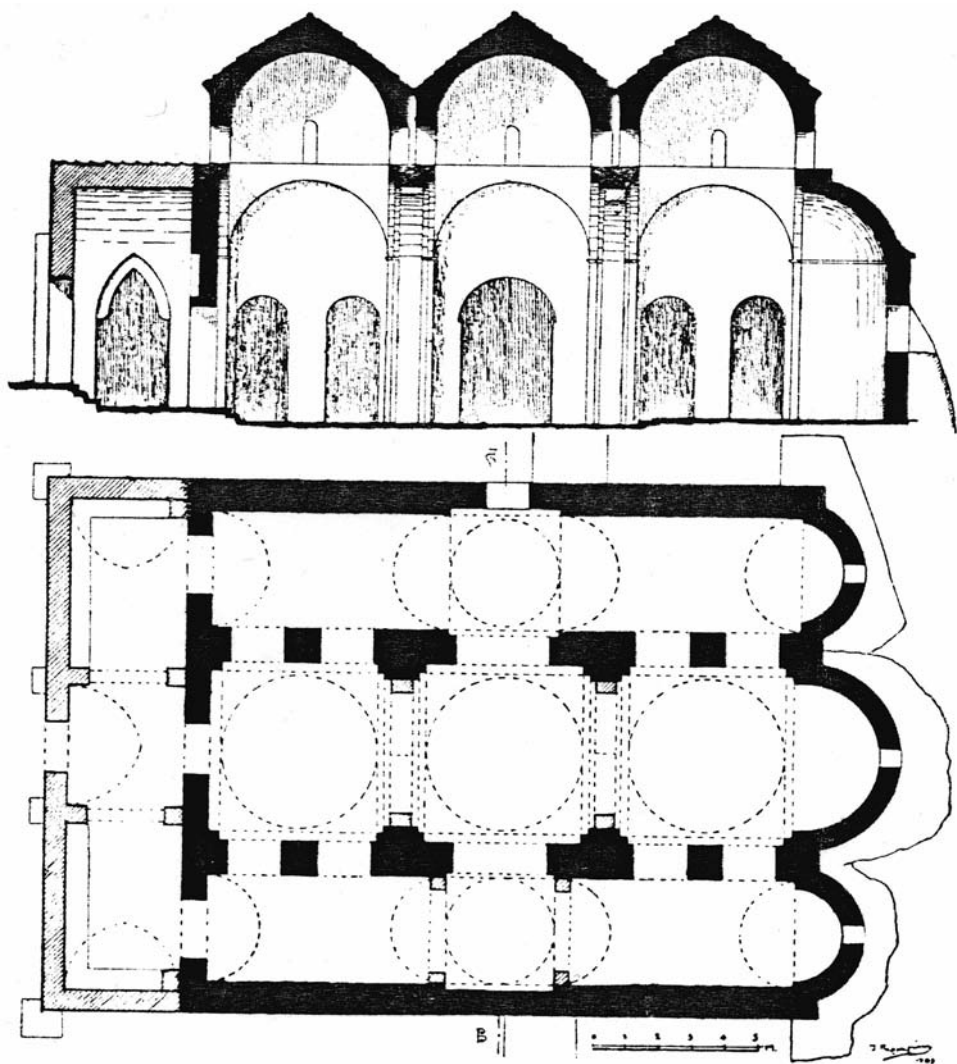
SS Barnabas and Hilarion, Peristerona, Cyprus: ground plan and longitudinal section, after Soteriou 1940.
